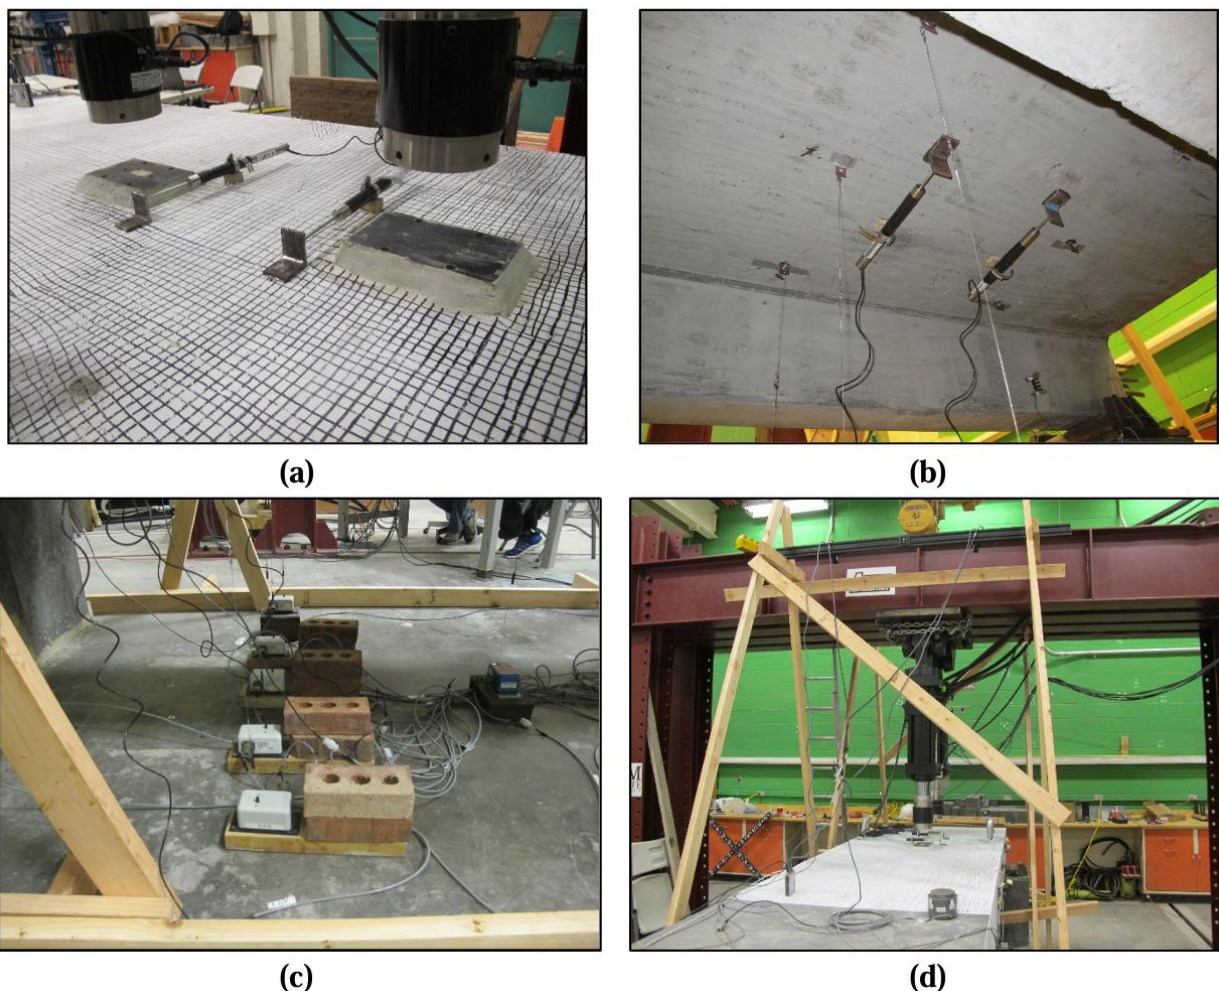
Transverse flexural testing instrumentation - LVDTs attached to the surface; a) top face; b) bottom face; c) string potentiometers placed along transverse section below load point; d) simple timber frame for DIC; (UHPC Phase III, Figure 8.49)
